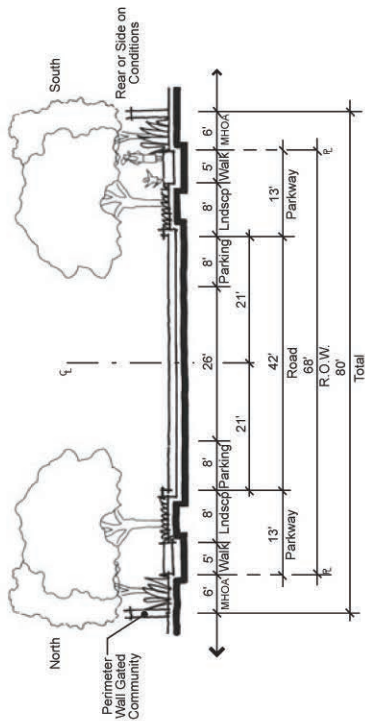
S: ROADWAY SECTIONS BB, CC1, D3 & D4
